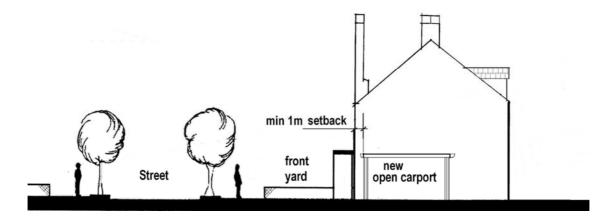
Side view – a new open carport must be set back at least 1 metre from the front façade of the dwelling.
